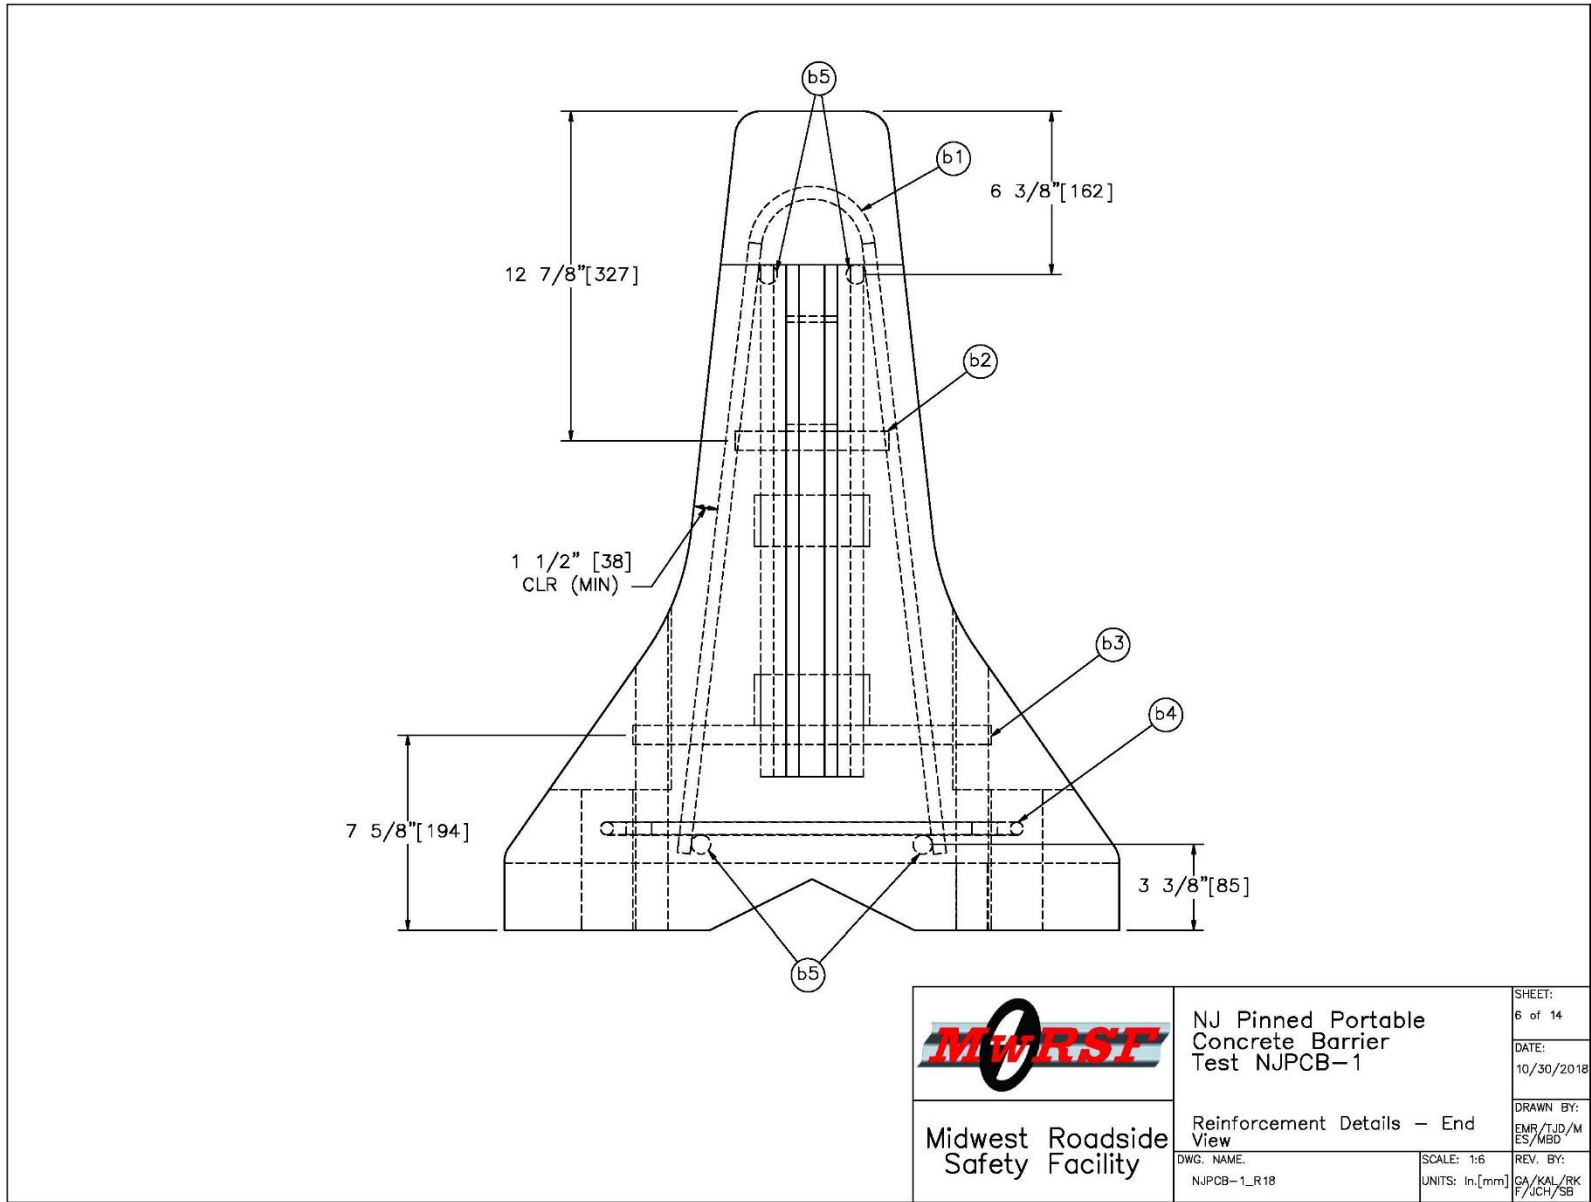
PCB Reinforcement Details – End View, Test No. NJPCB-1
